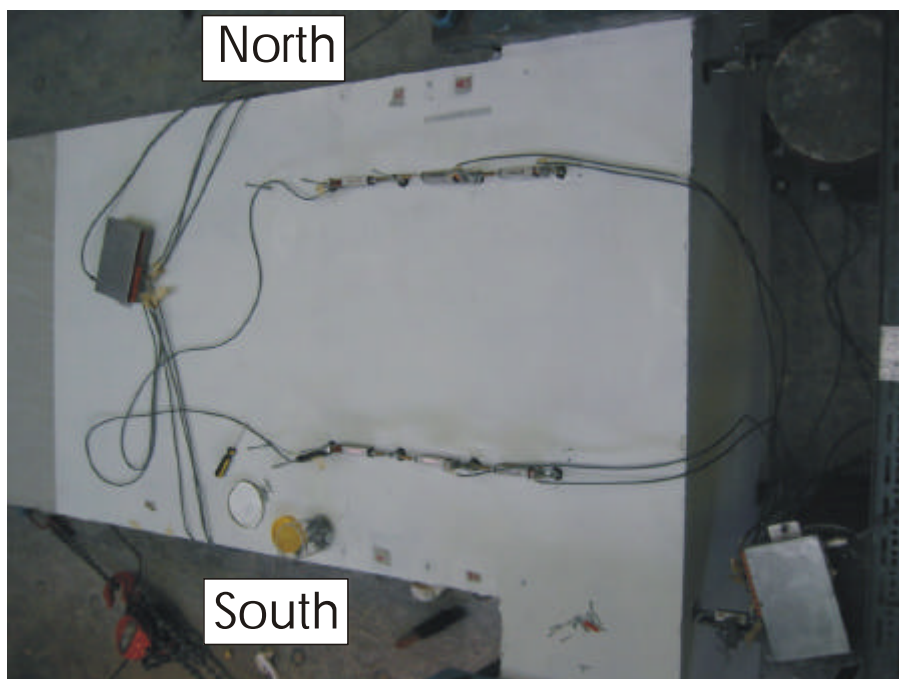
Plan view showing the location of the starter bar potentiometers
